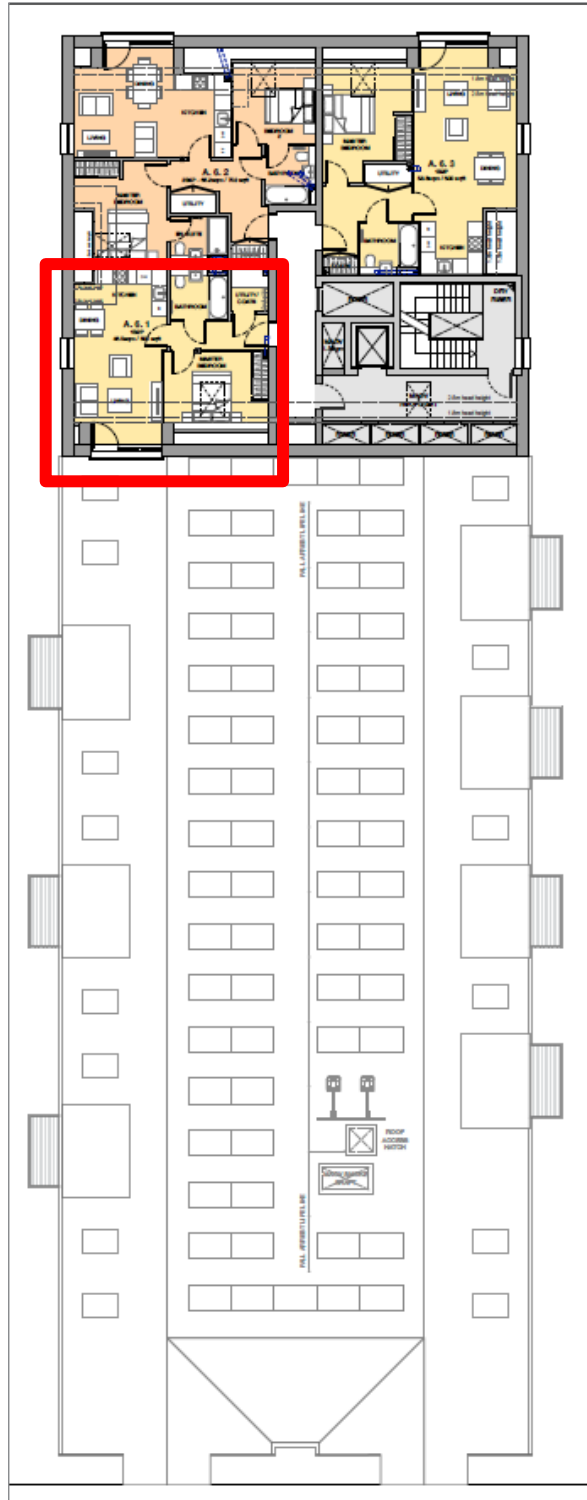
Block of flats type, 1bed top floor dwelling used for the assessment – Floor Plan.
